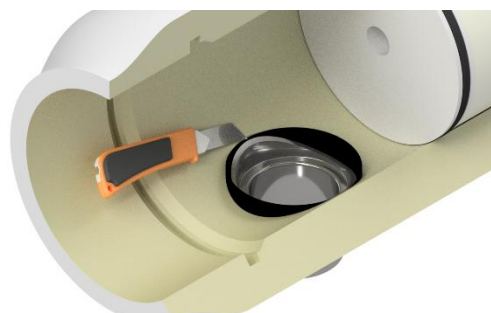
Side port Assembly after remove the excess of rubber.
